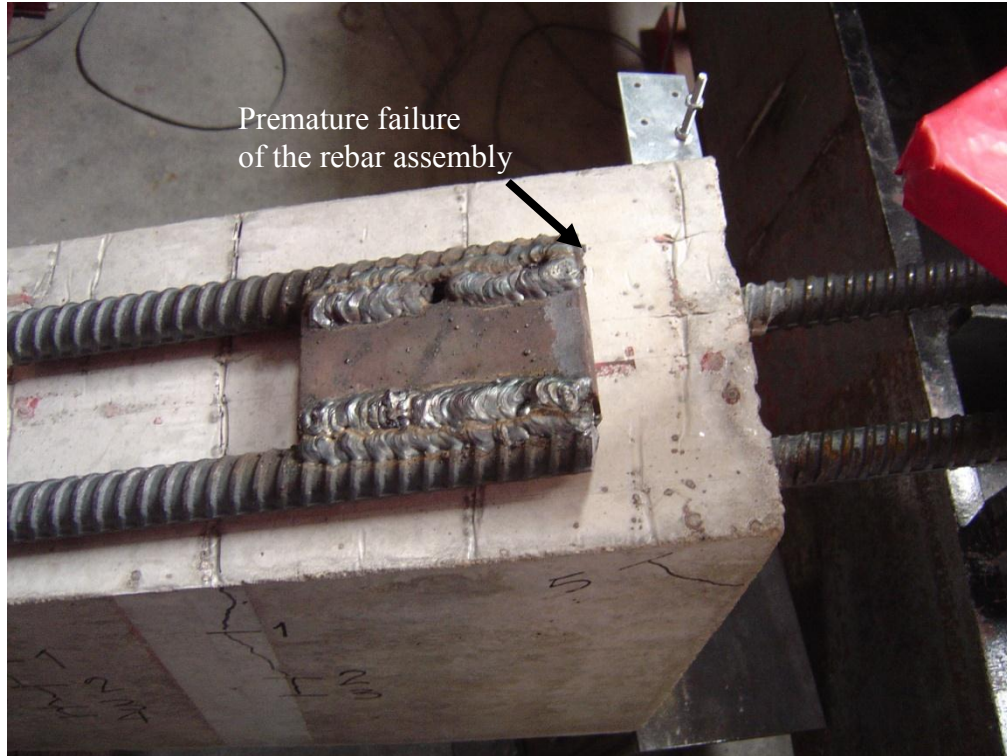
The rebar assembly failure for ECB-RA1
